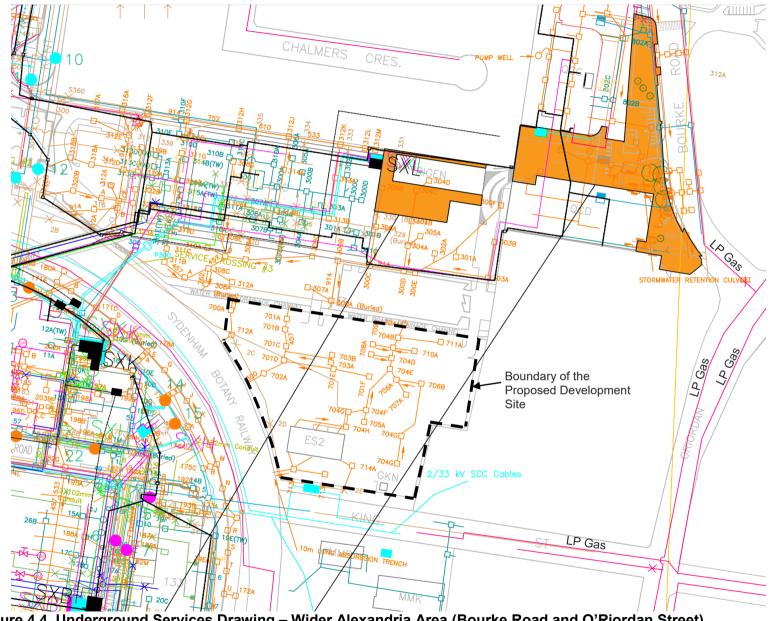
Underground Services Drawing - Wider Alexandria Area (Bourke Road and O'Riordan Street)
